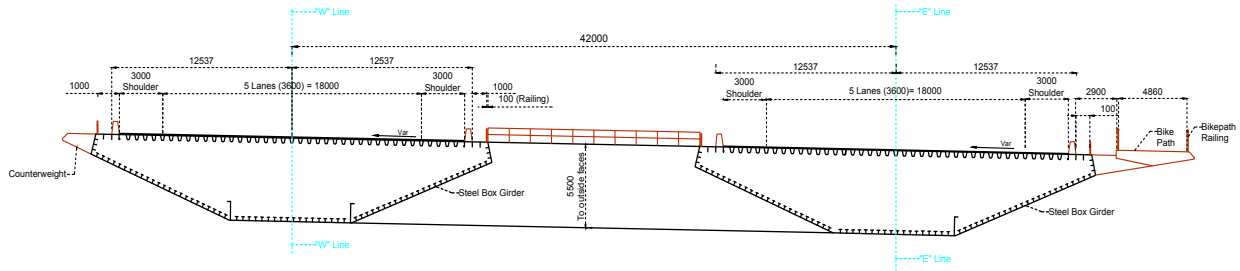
Typical Cross section of the deck (Ref.: AutoCAD made by the author)
